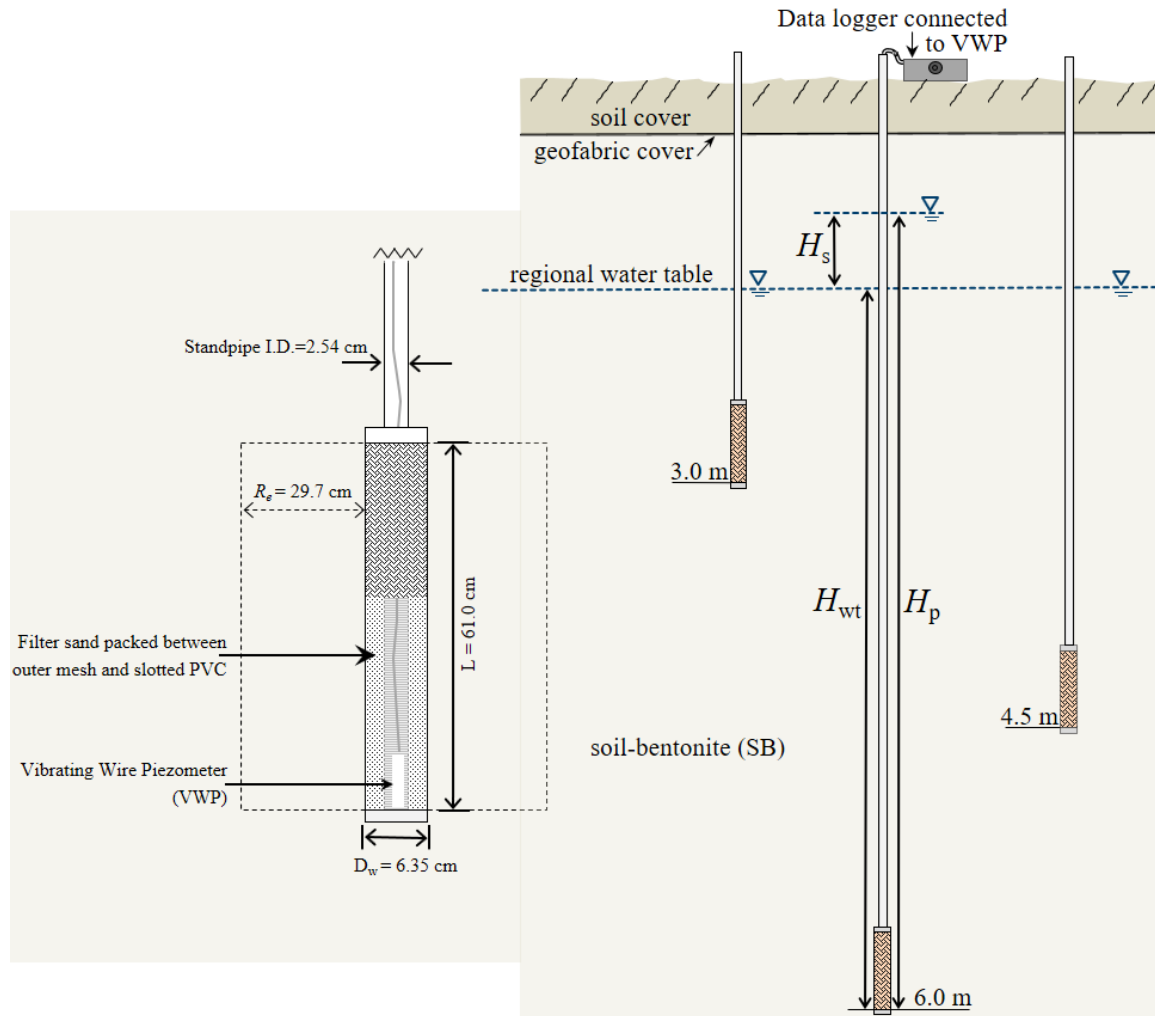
Schematic of prepacked slug test well cluster (right) with exploded diagram of prepacked screen assembly (left) with standpipe and screen dimensions (not to scale).
